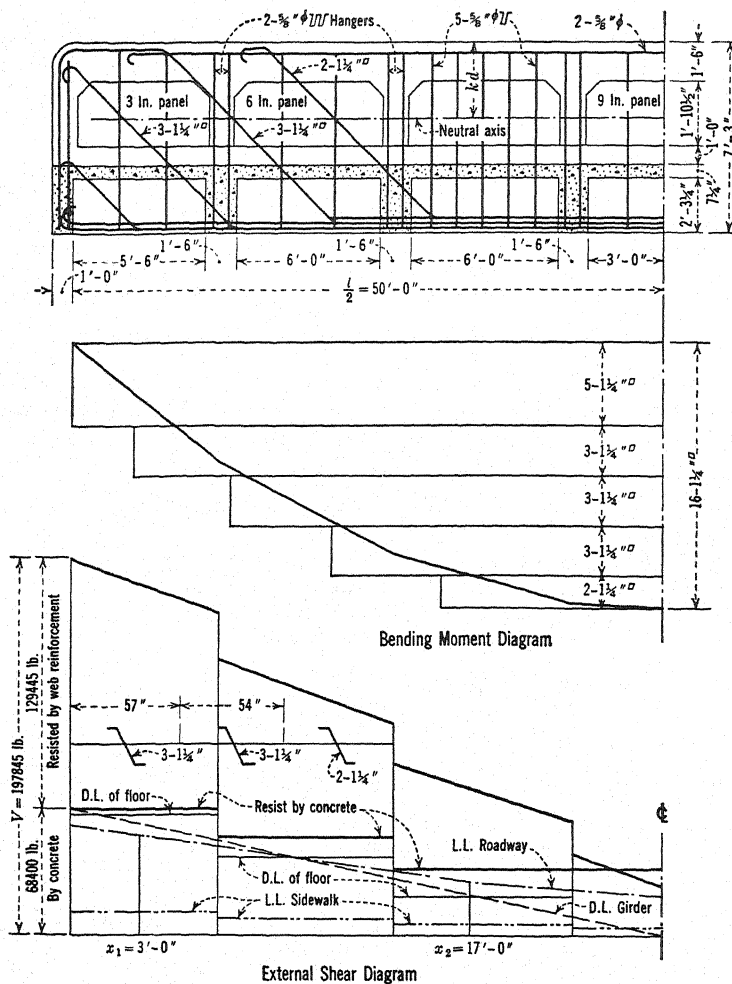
Girder Details for Through Bridge. (See p. 106.)
